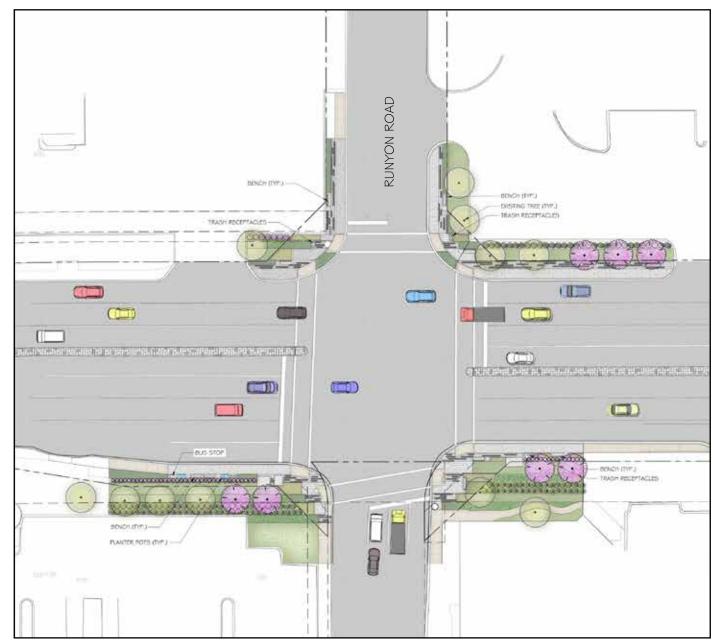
Runyon Road Intersection Plan Rendering- Sample Location B
